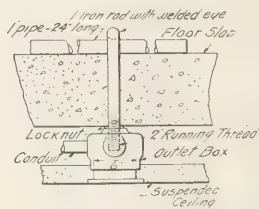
DETAIL OF SPECIAL OUTLET BOX AND FIXTURE SUPPORT FOR SUSPENDED CEILINGS IN PUBLIC CORRIDORS
